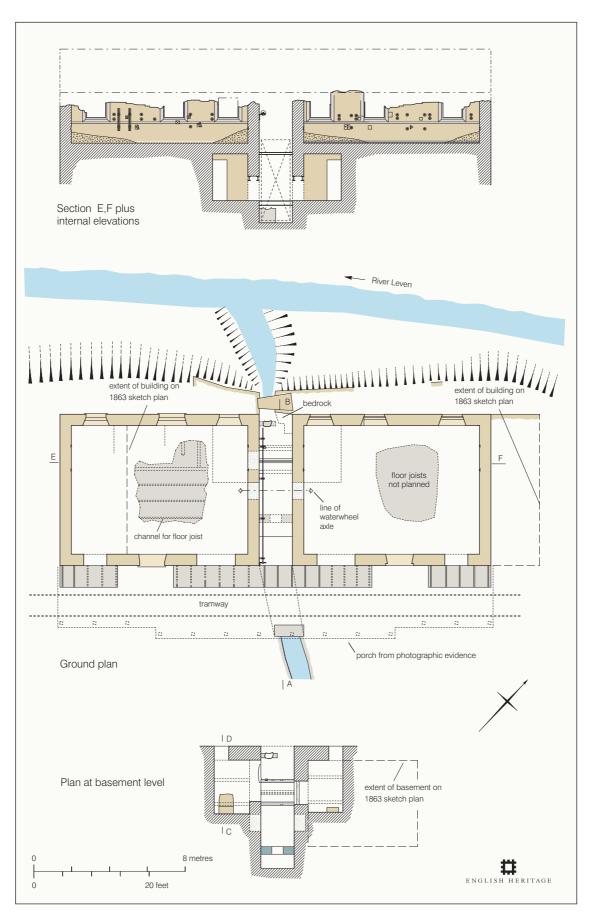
EH plans and long section of the glazing house (see page xiv for key to conventions).
